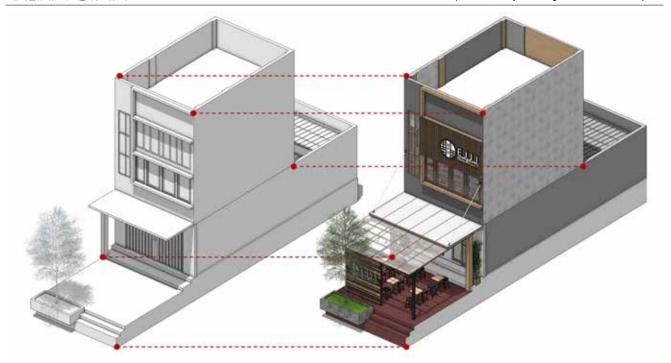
Ejji Coffee Design Based on Existing Building (Source: Author's Document, 2025)
